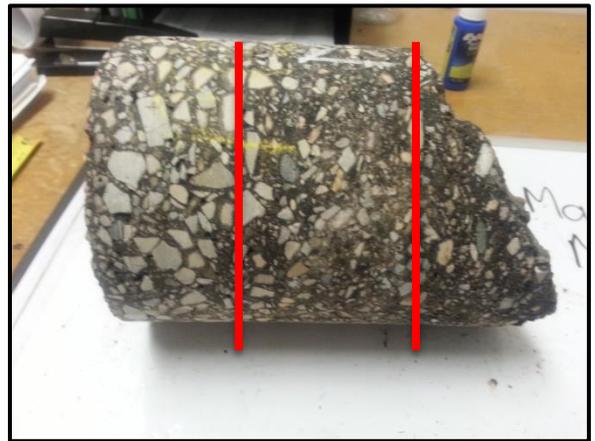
SR-32 Peoa-Marion Pavement and Typical Core
